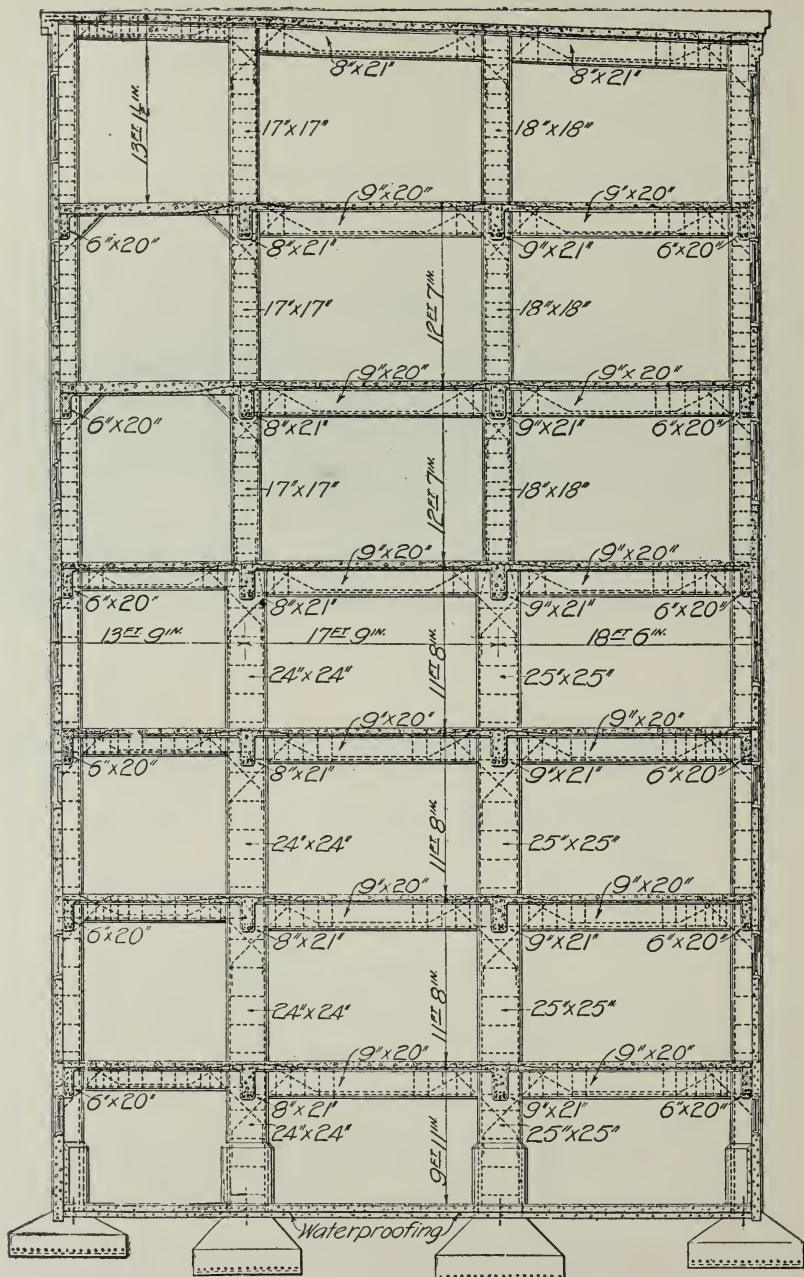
Cross-section Through Reinforced Storage Warehouse, Lynn, Mass.
